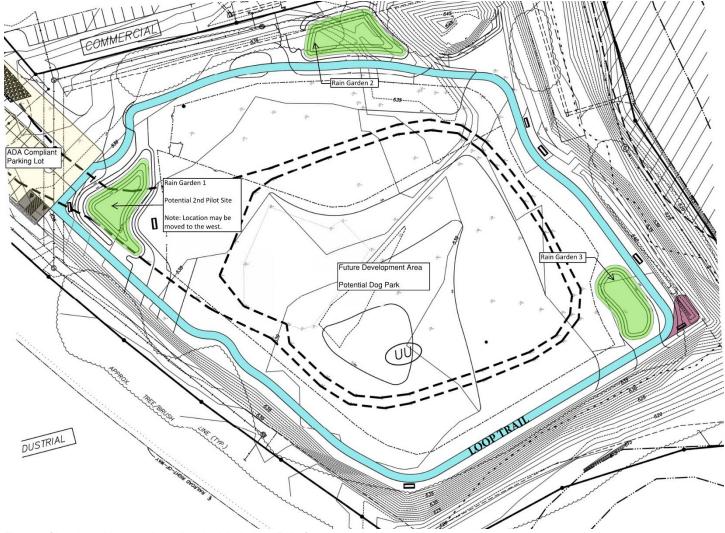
Site plan with secondary pilot site labeled as "Rain Garden 1."
